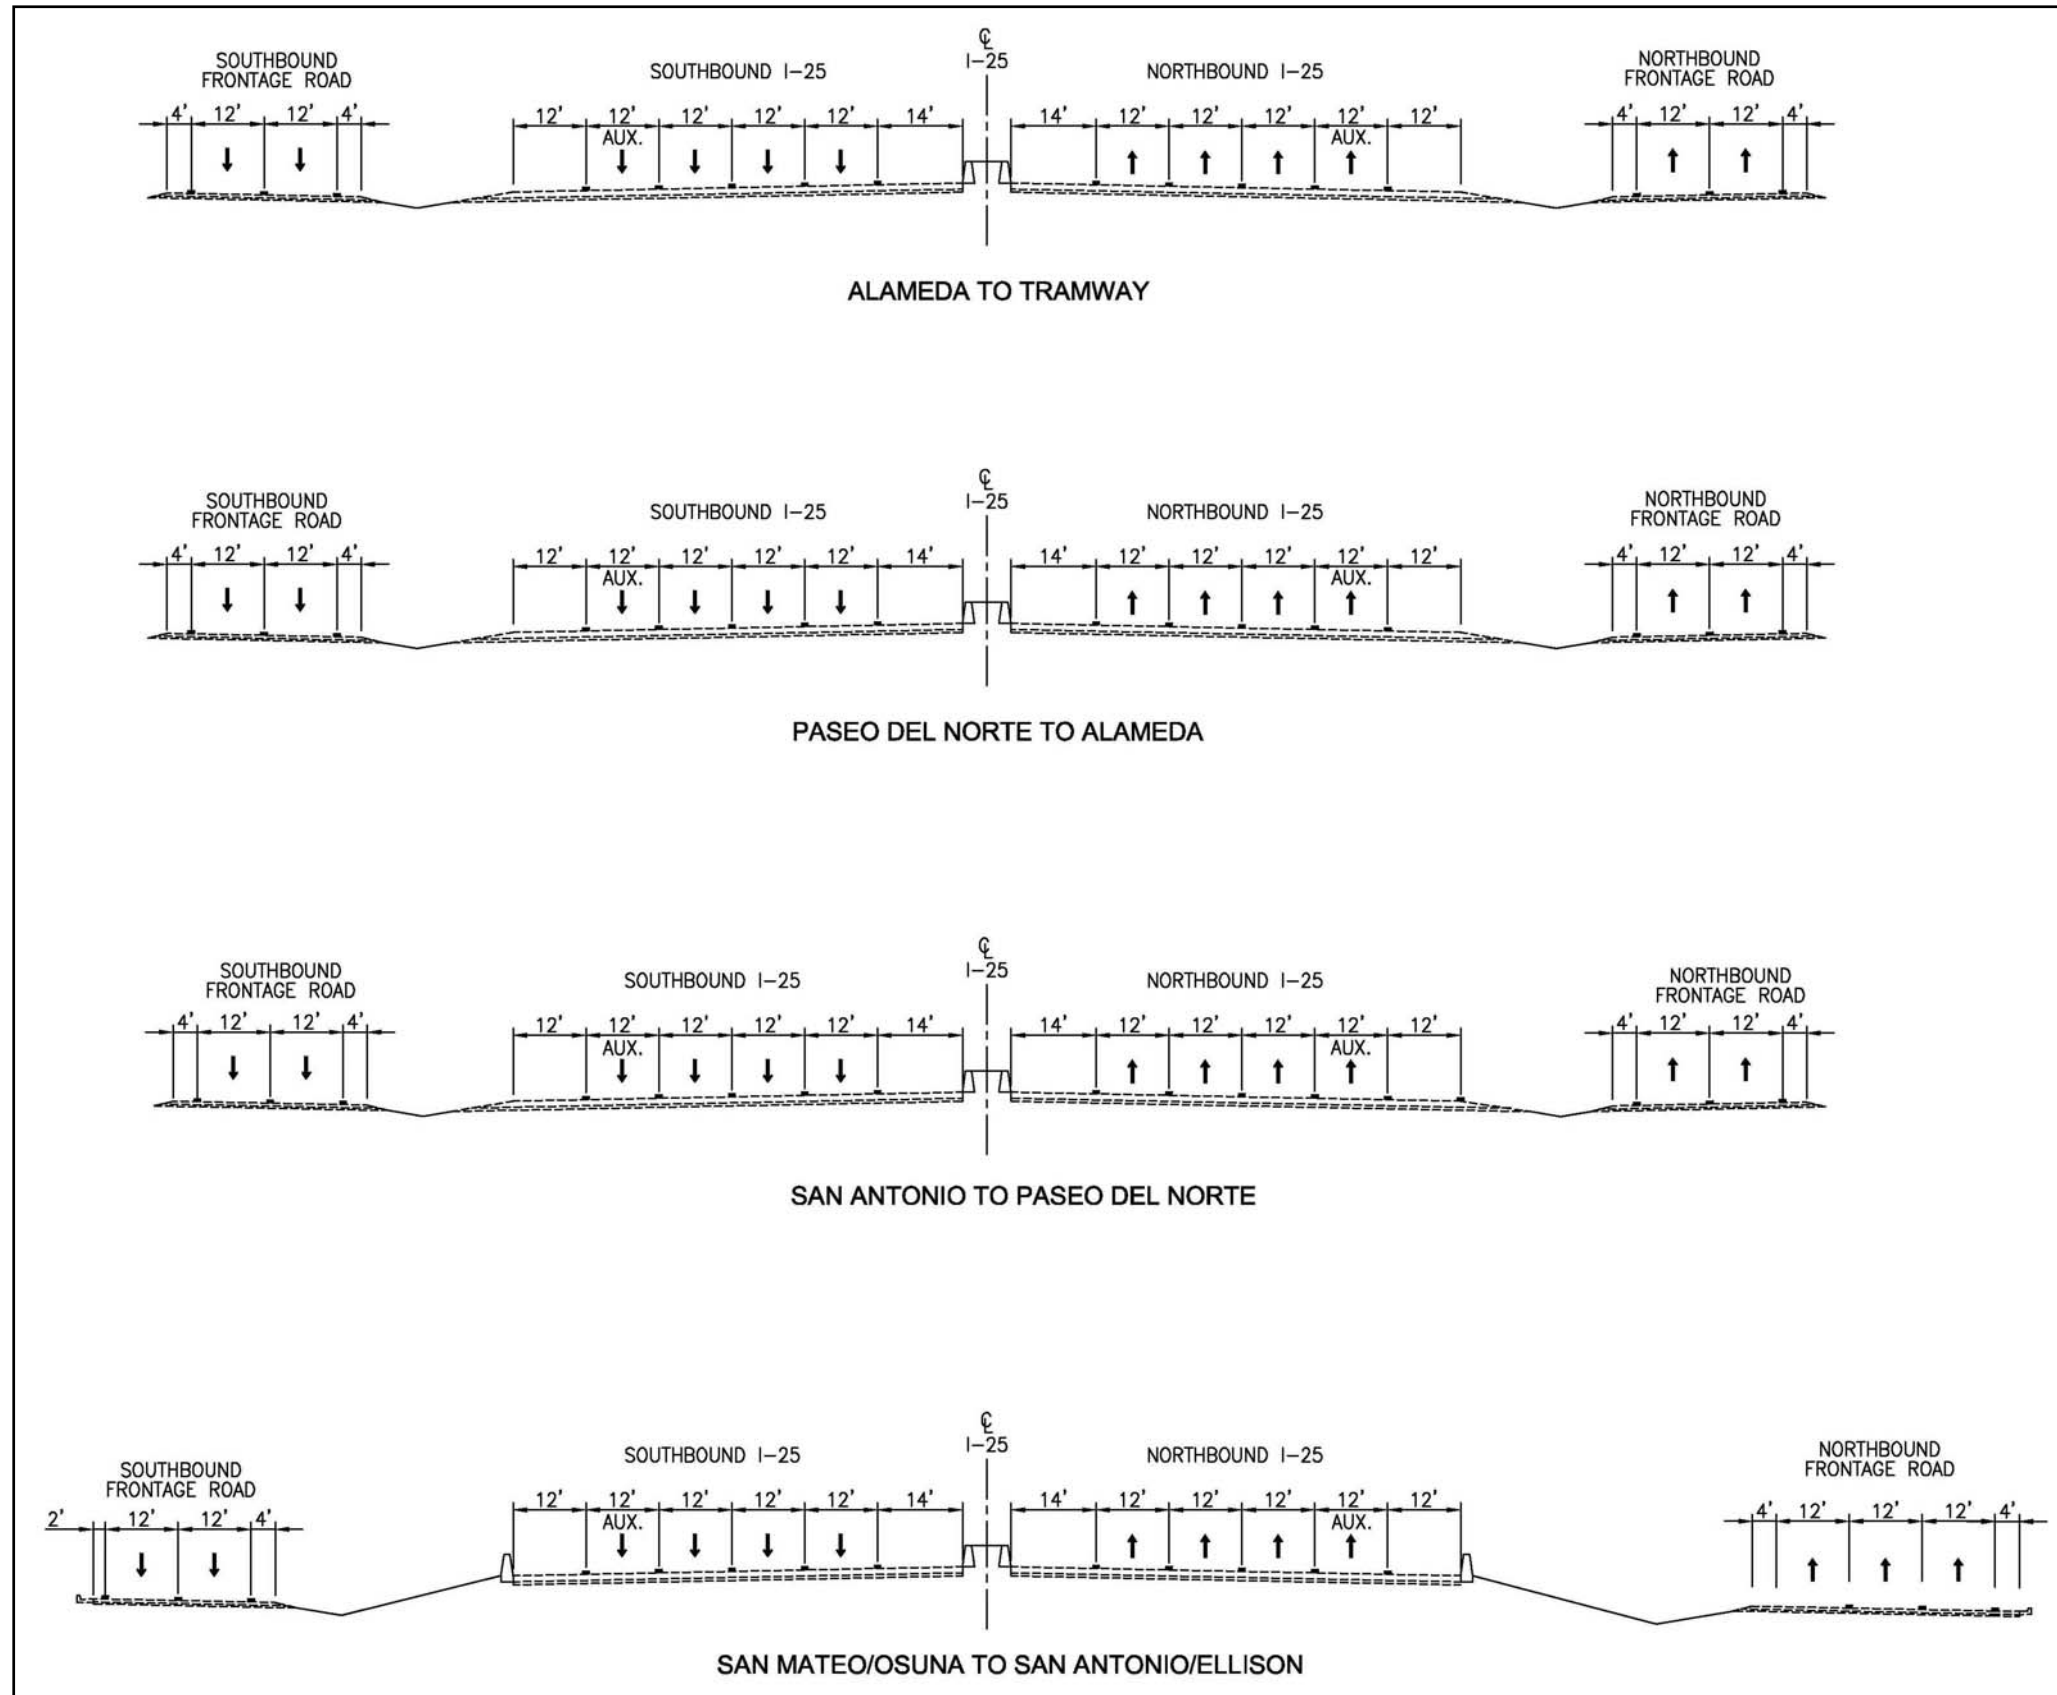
, Existing Condition and No-Build Alternative Typical Sections (continued)
